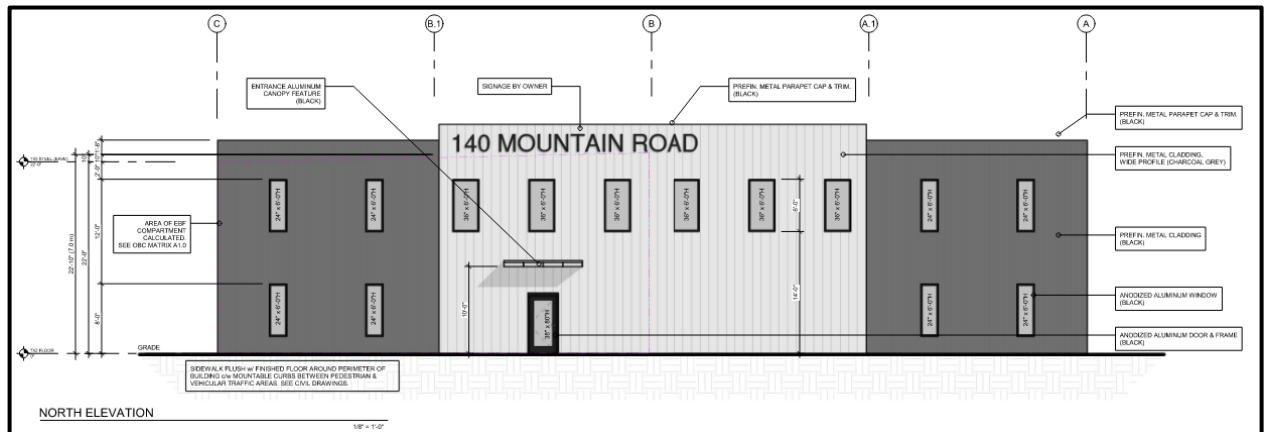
North building elevation showing the two-storey design on the Mountain Road frontage
